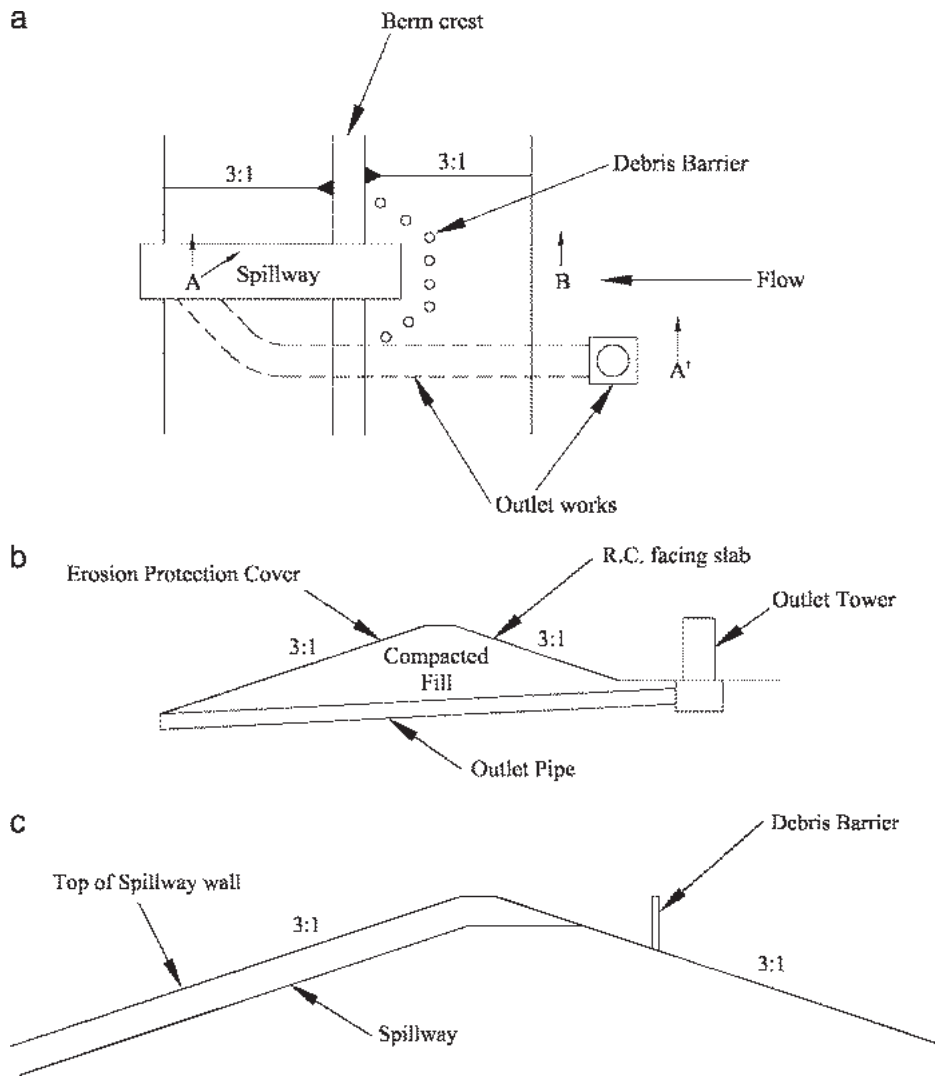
Layout of L.A. County's debris basin components (not to scale) (after Easton et al., 1979): (a) Plan view, (b) Section A-A', and (c) Section A-B.
